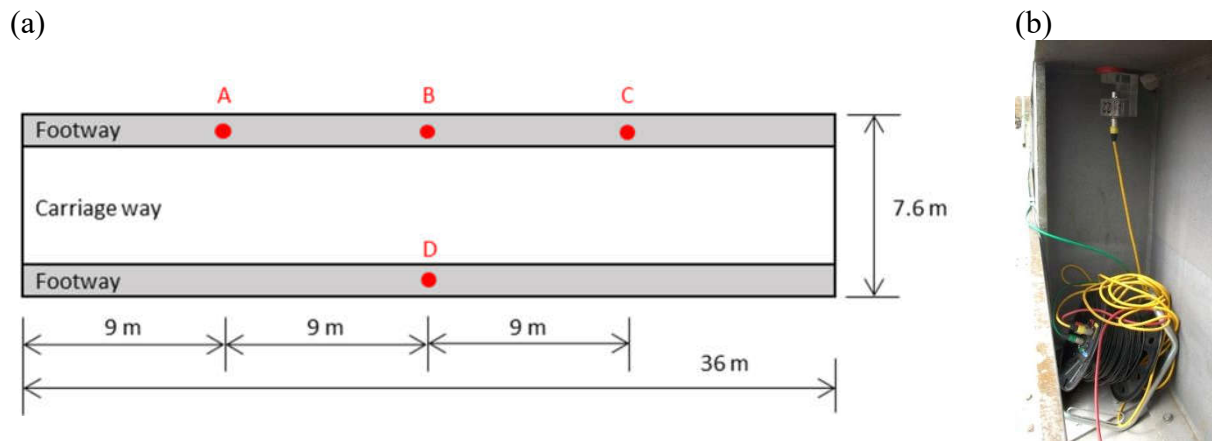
Dimensions and instrumentation details for Bridge B (a) Plan view of bridge deck and sensor locations; (b) Accelerometer attached to underside of the girder top flange.
